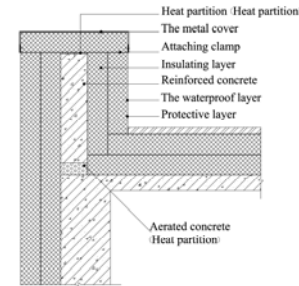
FIGURE V. PARAPET WALL INSULATION CONSTRUCTION
